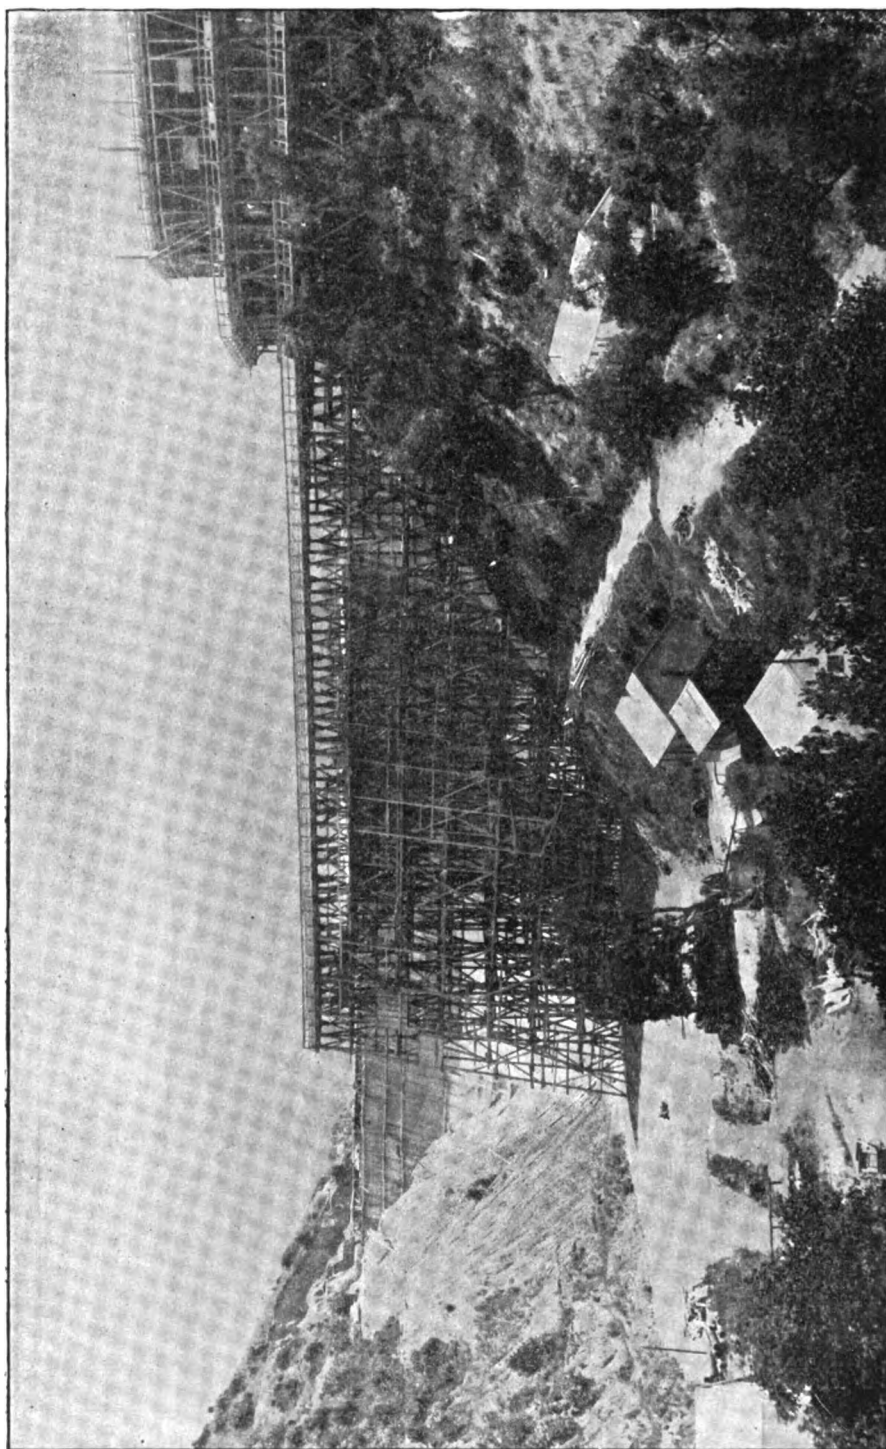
PLANT FOR MIXING AND HANDLING CONCRETE AT SAN MATEO DAM.
